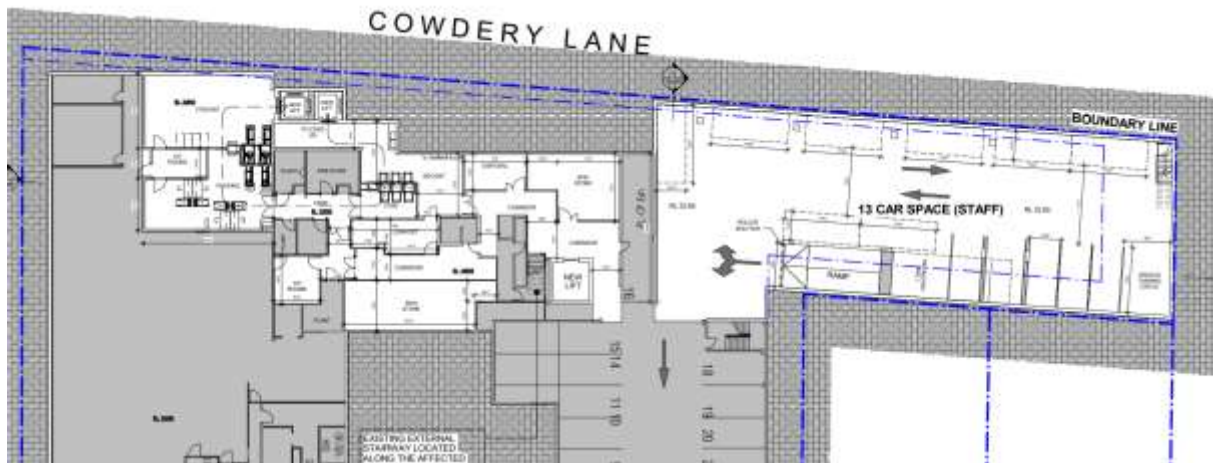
DA Proposed basement alterations and additions. Source: HPI
